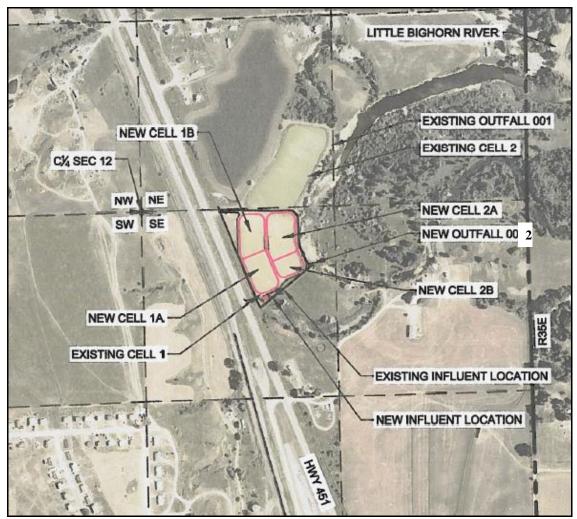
Aerial photograph showing the existing and future layout of the Lodge Grass WWTF.
